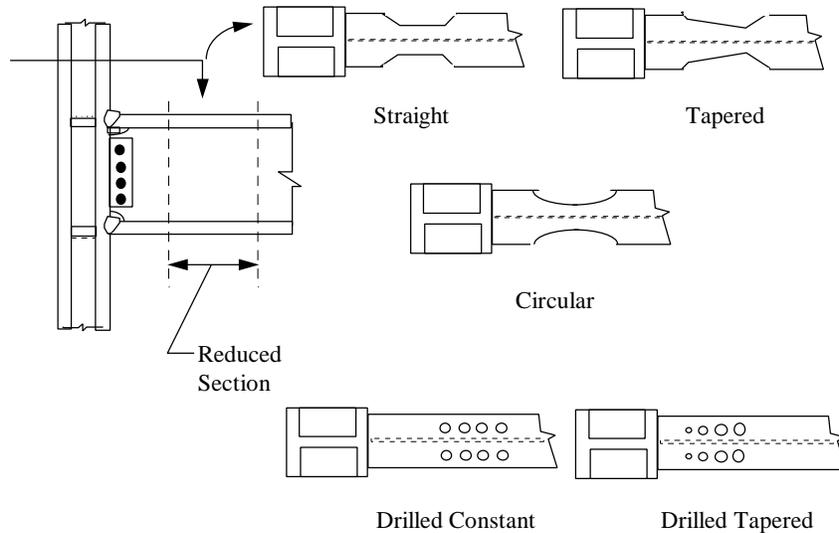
7.9.6-1 - Reduced Beam Section Connection
